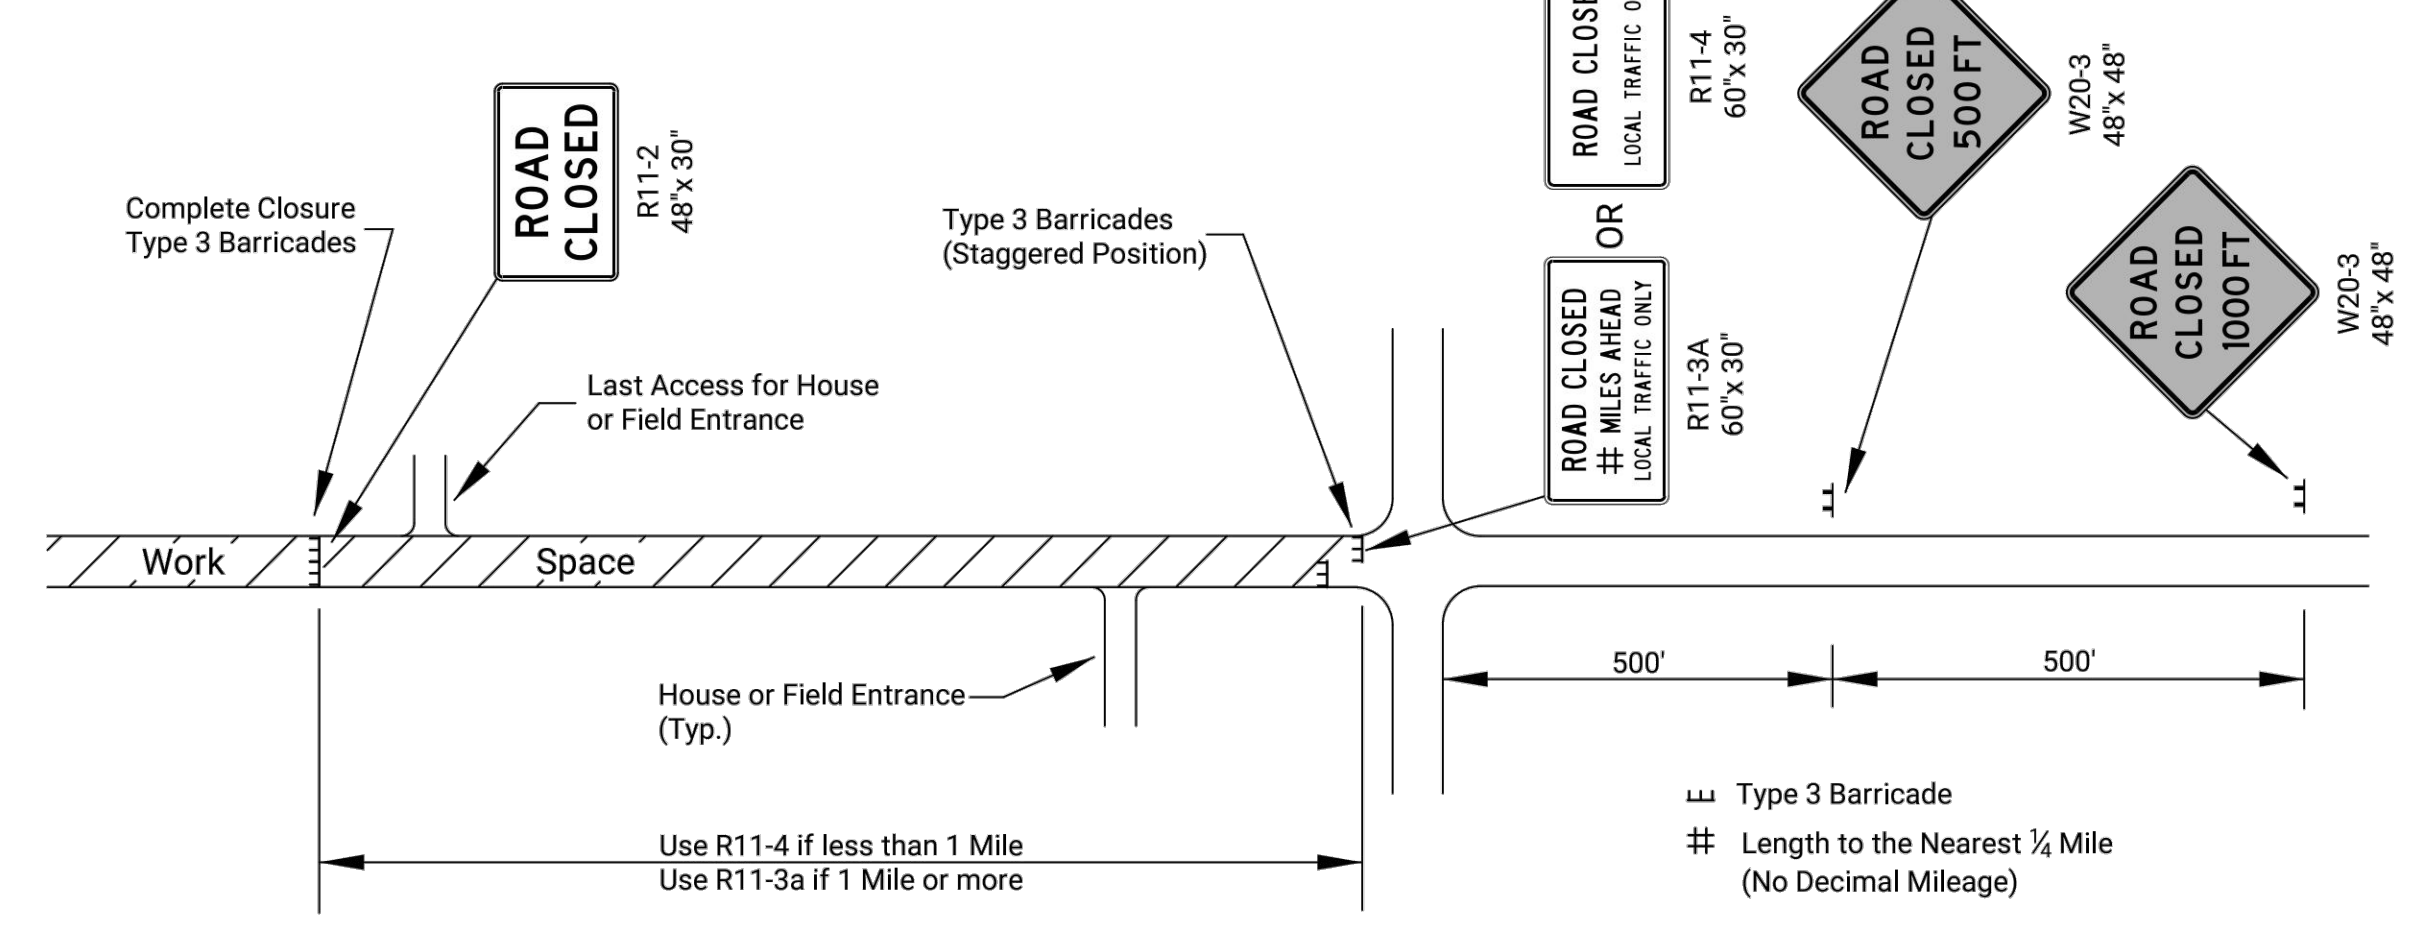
TYPICAL SIGNING FOR ROAD CLOSURE - LOCAL TRAFFIC ACCESS
